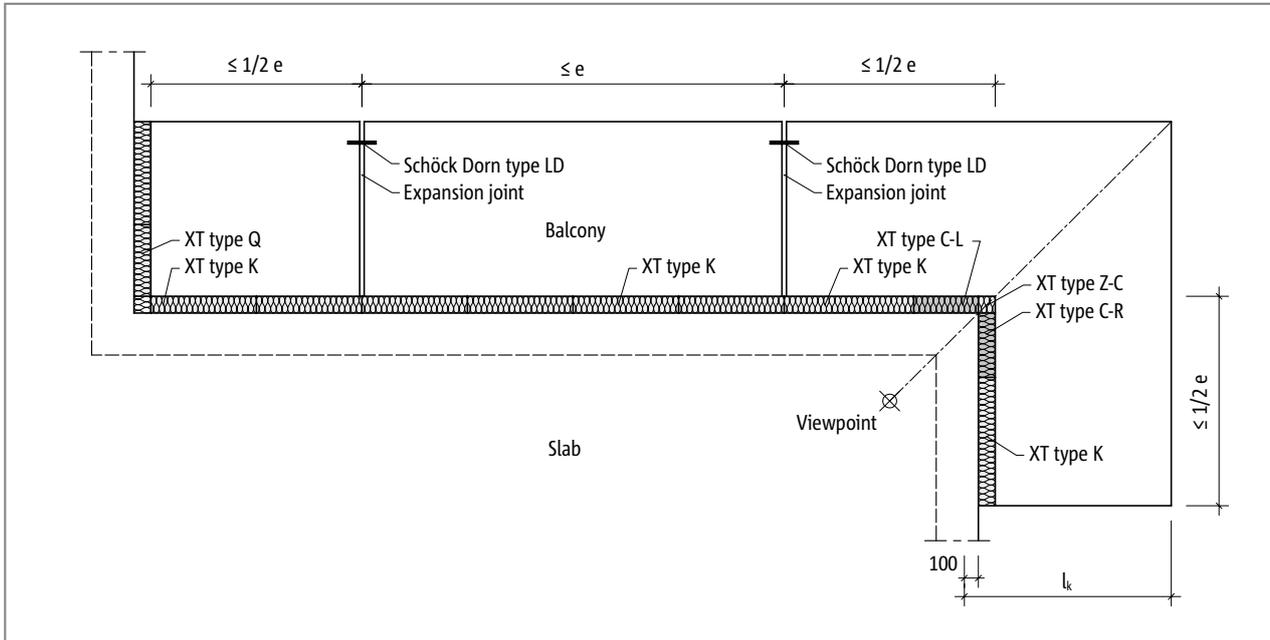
Schöck Isokorb® XT type C: Expansion joint arrangement
